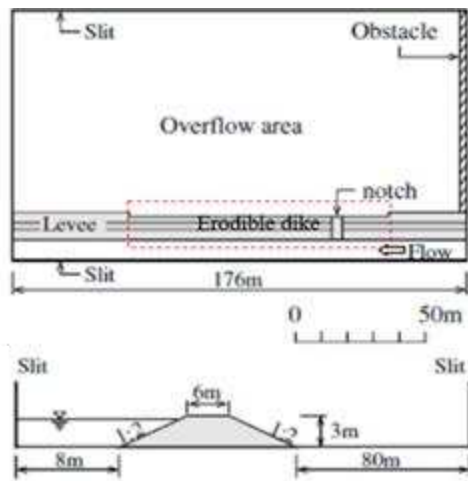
"Case 4" experiment - Plan view and cross-sectional profile (adapted from Kakinuma and Shimizu [5]).
